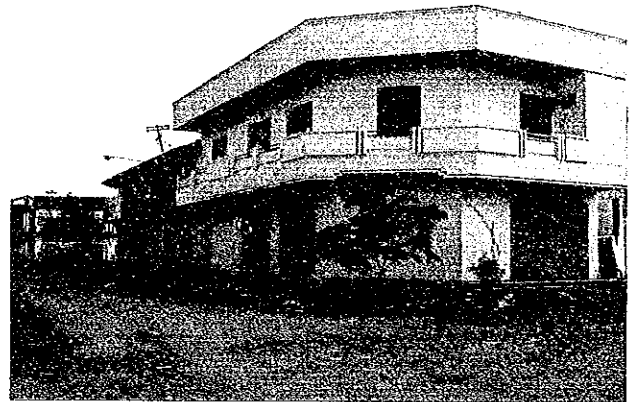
Reinforced Concrete Masonry Wall Building; Slight Damage Adjacent to the Building Photo No. 4.51
